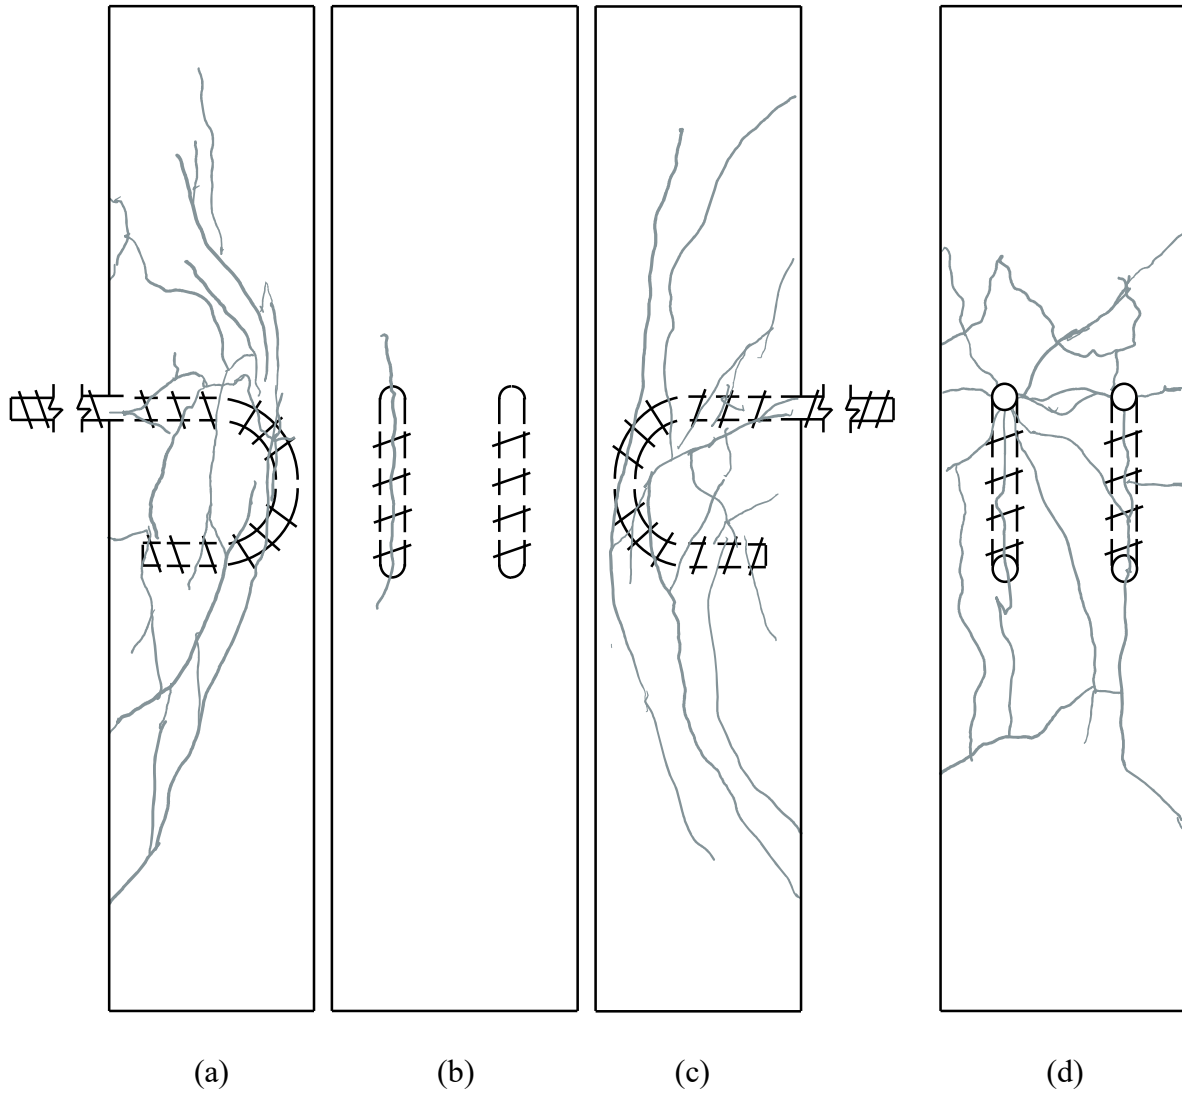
Crack pattern at maximum normalized tensile load for beam-column joint specimen MD6-180: (a) west side face, (b) back face, (c) east side face, and (d) front face
